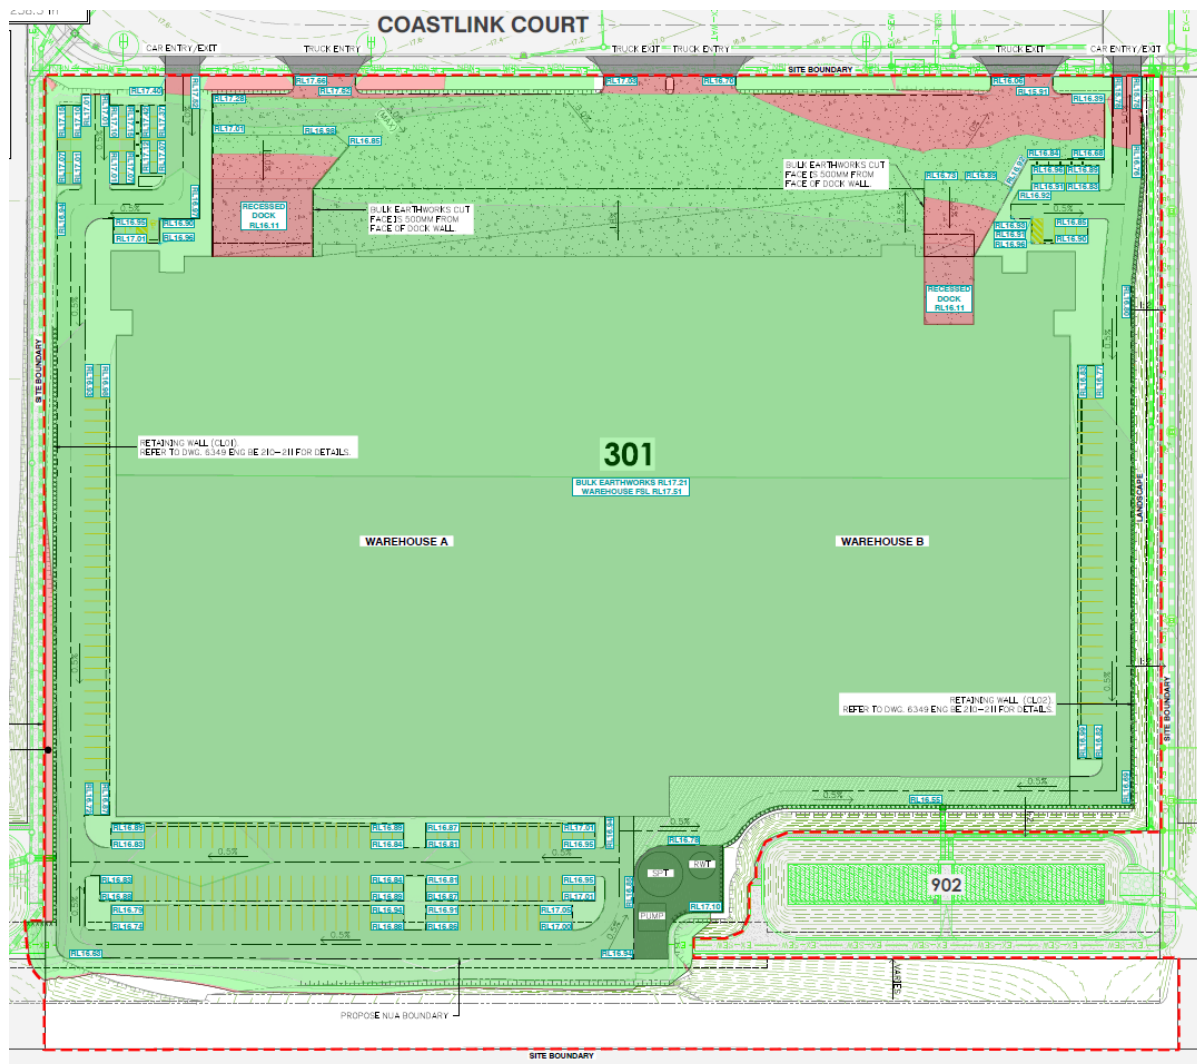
Bulk Earthworks Layout Plan (Source: Applicant submitted material)
